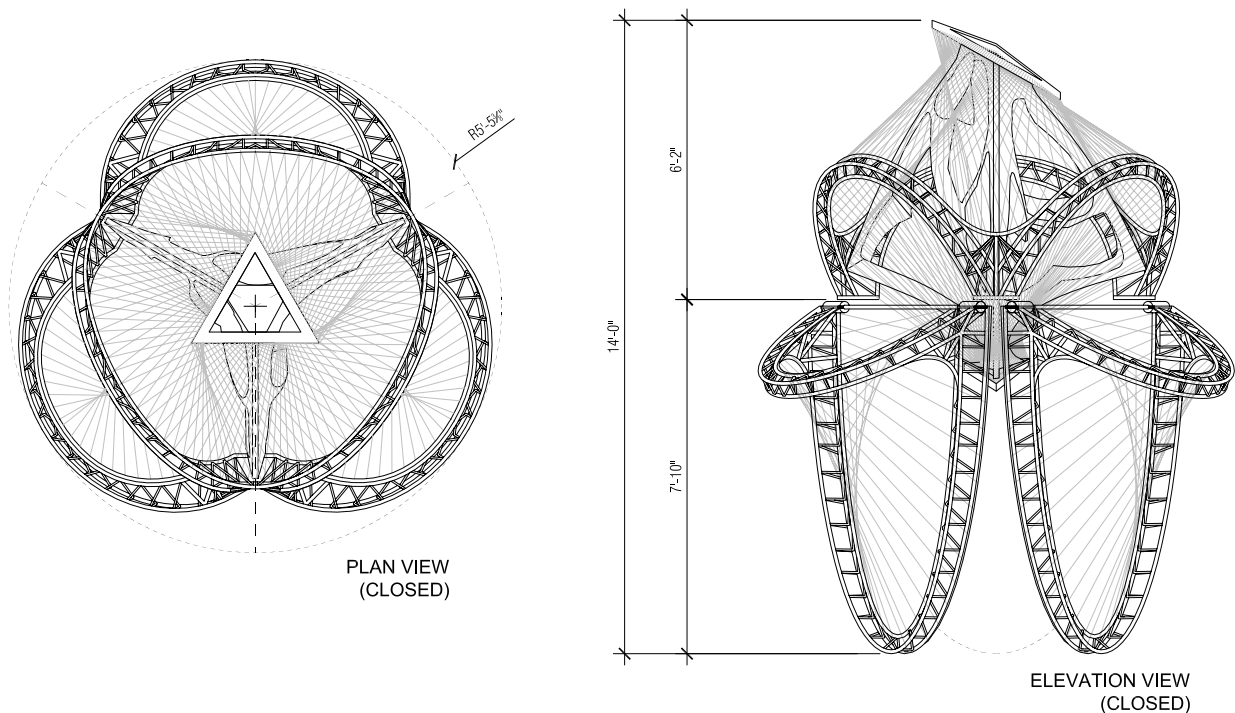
Plan and elevation drawings of the “closed” position of the Chandelier (drawn by Arjuna Imel).
